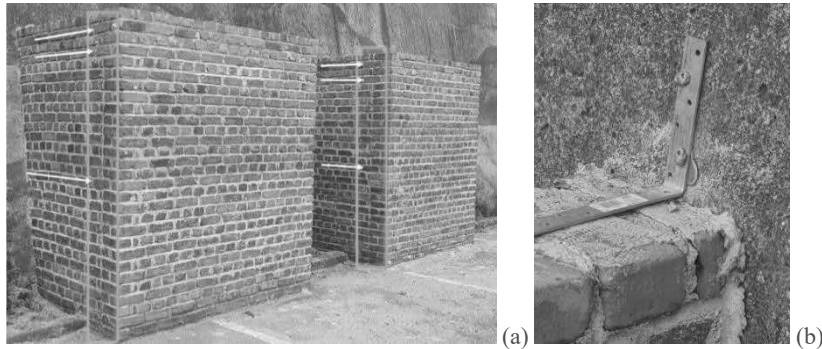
(a) The two C-shaped walls panels and the location of brick connectors (white arrows), (b) steel bracket used to connect return walls to reinforced concrete wall.
